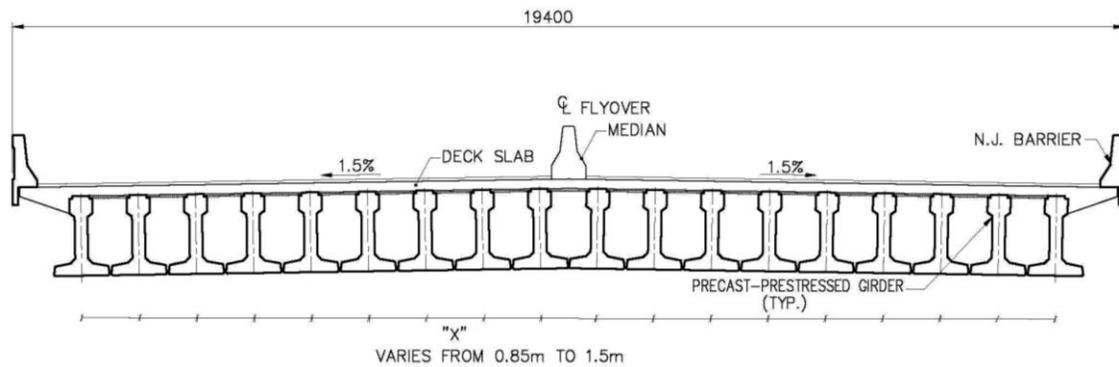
Bridge Cross Section for Inverted T Girder Super Structure
